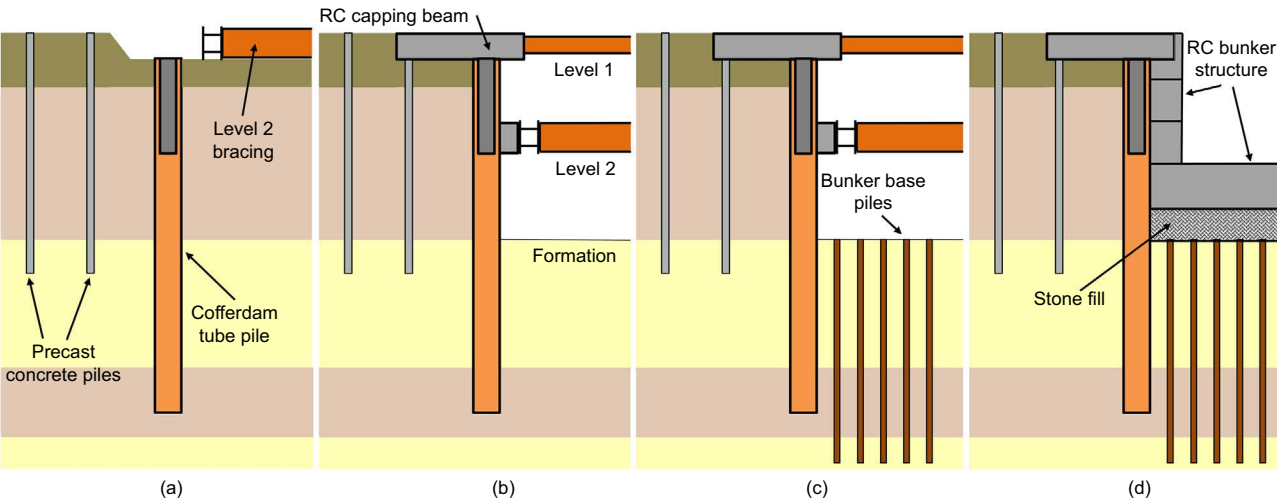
Typical section through excavation wall at key stages of the construction sequence: (a) stage 3; (b) stage 10; (c) stage 11; (d) stage 17
